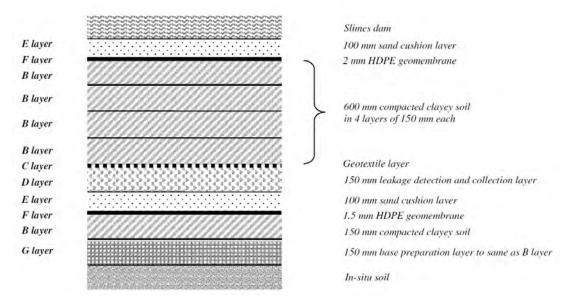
(a): Proposed Lining System for New Slimes Dam.
